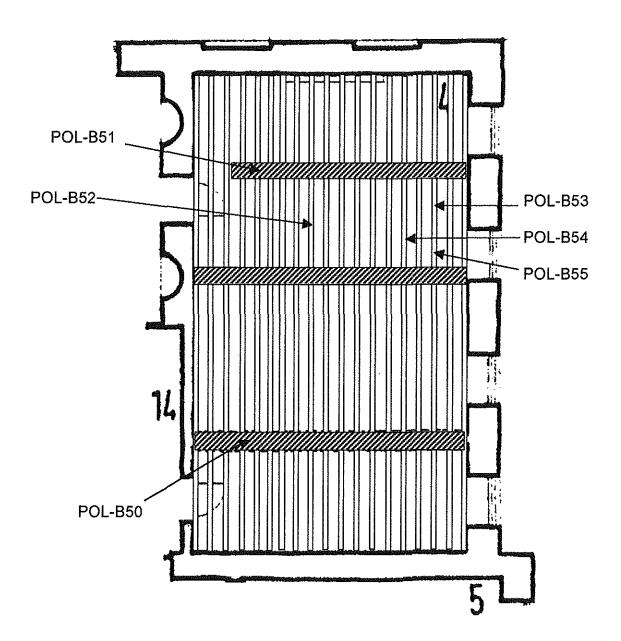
South range, ground-floor plan (room 4), showing the location of samples POL-B50-55 (Louis Hawkins, Architect)
